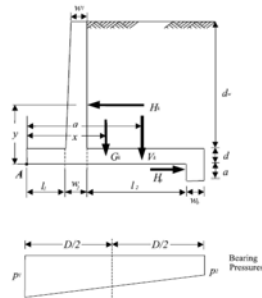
Cantilever wall - design variables, forces and bearing pressures.
